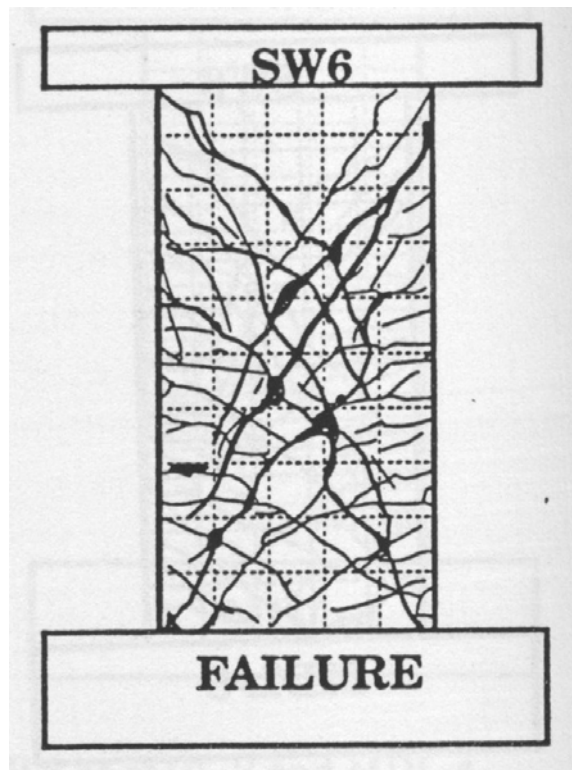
Condition of wall SW6 at 1.83% drift [Pilakoutas (1991)]
